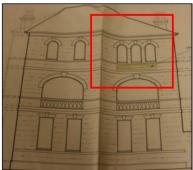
1991 amendments showing proposed deletion of the concrete balustrade from the trio of windows on the second floor of the Bates Steet elevation (below) and proposed new openings on the western elevation.
